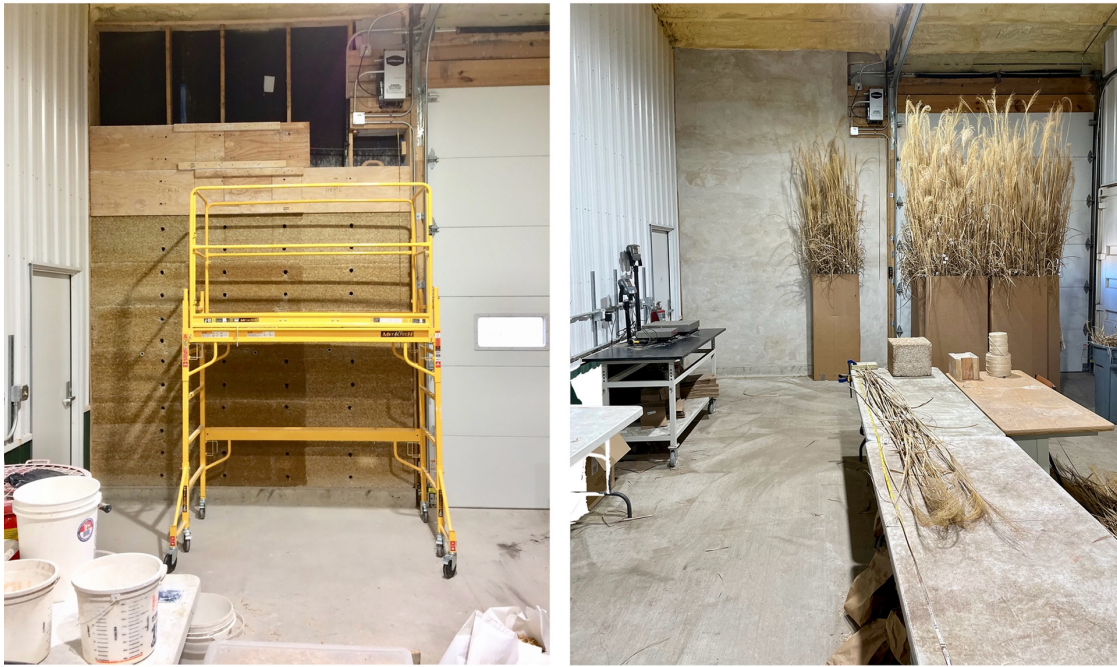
East demonstration wall under construction and complete. Source: (Author 2023)
